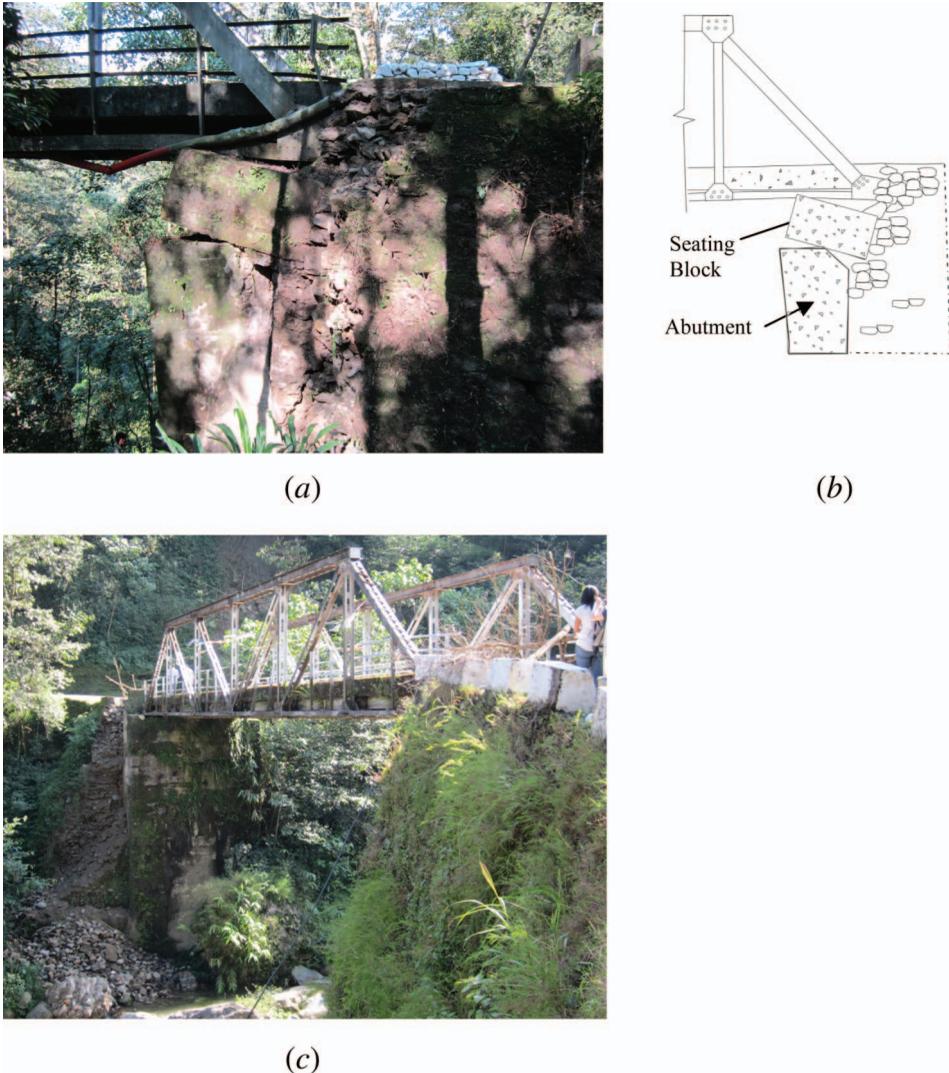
(a) Failure of seating block overhanging the abutment of Plaekhola Bridge, (b) schematic of the failure of seating block at Plaekhola Bridge and (c) damage to the wing wall of steel truss bridge on Raykhola.
